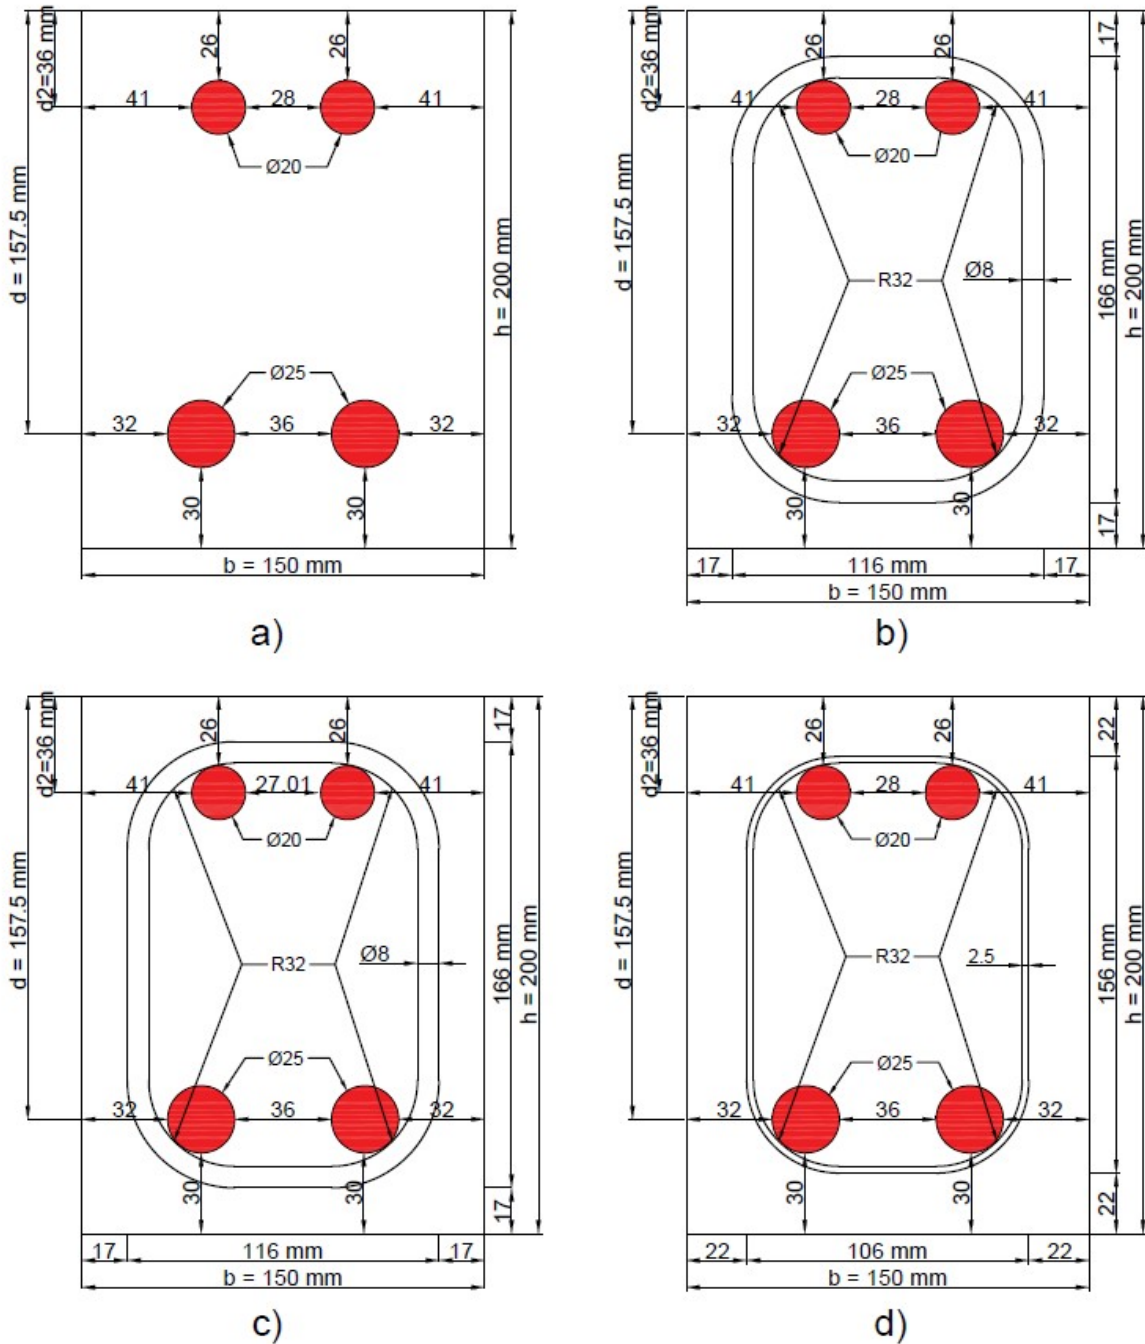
Beam cross-sections: a) No Stirrups in sample NS; b) Steel stirrups in sample S4; c) Braided BFRP stirrups in samples B4 and B8; d) Laminated BFRP UD strip stirrups in samples UD4 and UD8.
